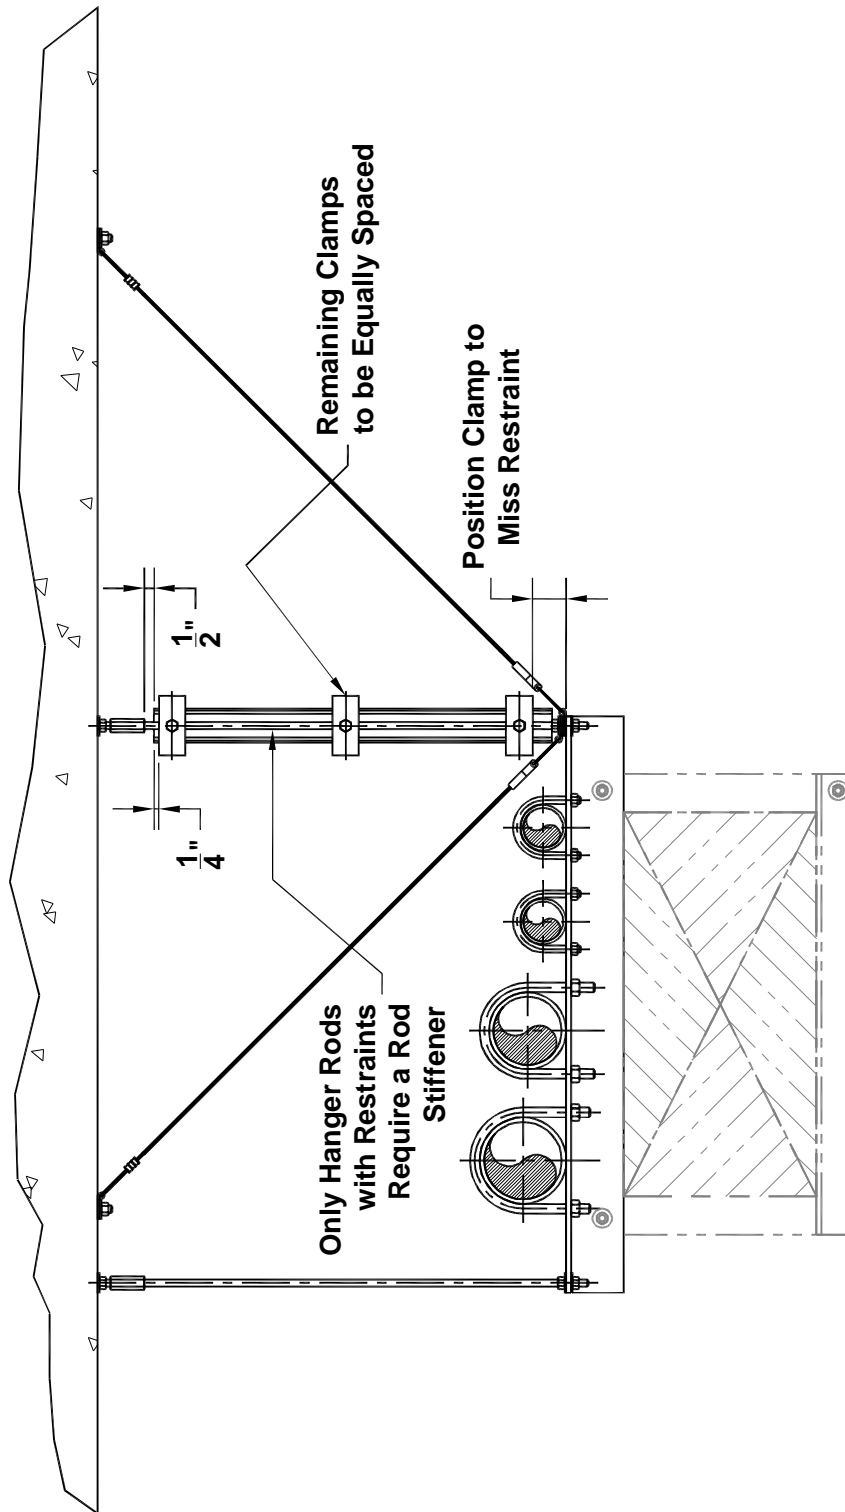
; Typical Rod Stiffener Installation for Trapeze Supported Pipe & Duct – One Rod
